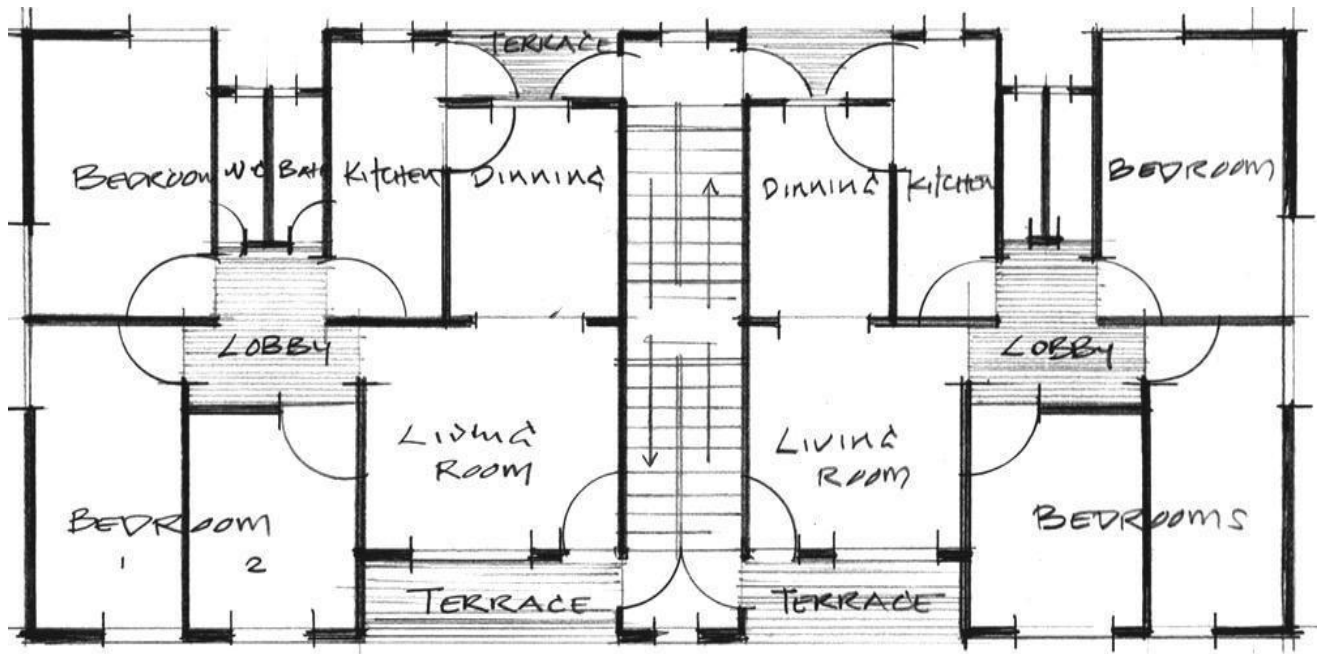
Floor Plan of a typical detached flat in planned estates
